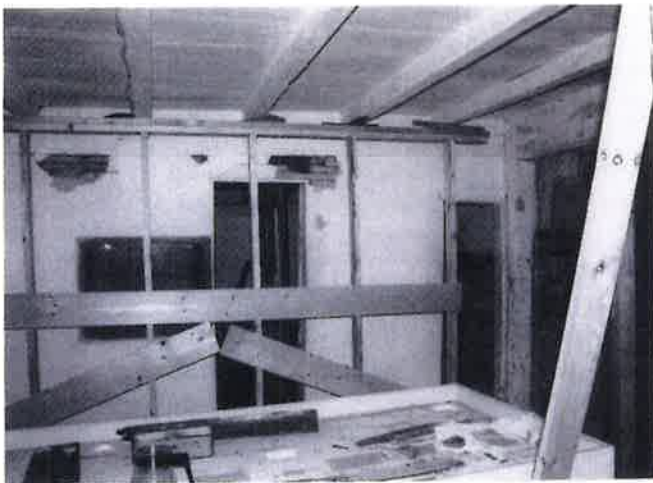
Interior bracing which will last the duration of the mothballing will protect weakened structural members. Jethro Coffin House. Photo: John Milner Architects.
